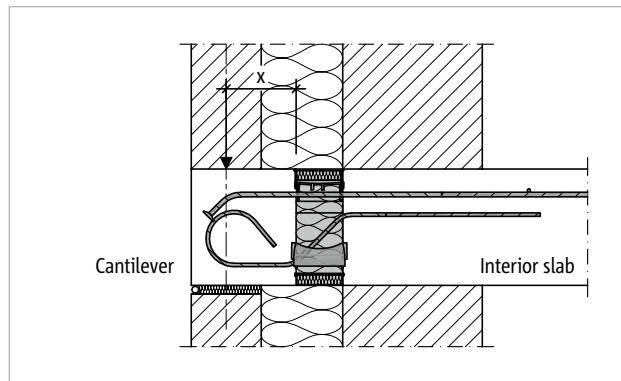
Schöck Isokorb® T Type CO: Corbel with faced masonry
